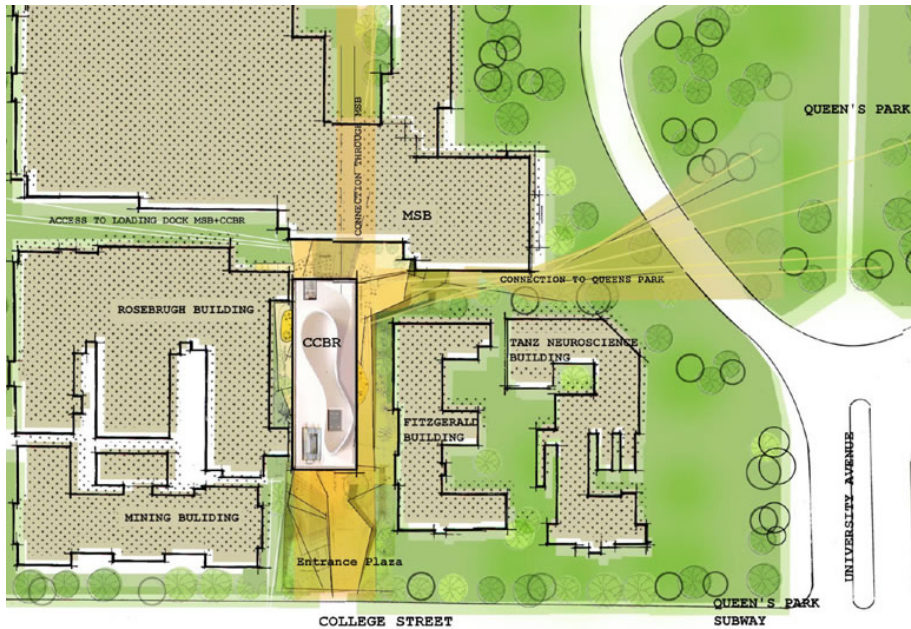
(Above): Architect's sketch of CCBR site plan. Figure 12 (Below): A collage elevation of the southern exposure indicating the heights of the surrounding buildings.
